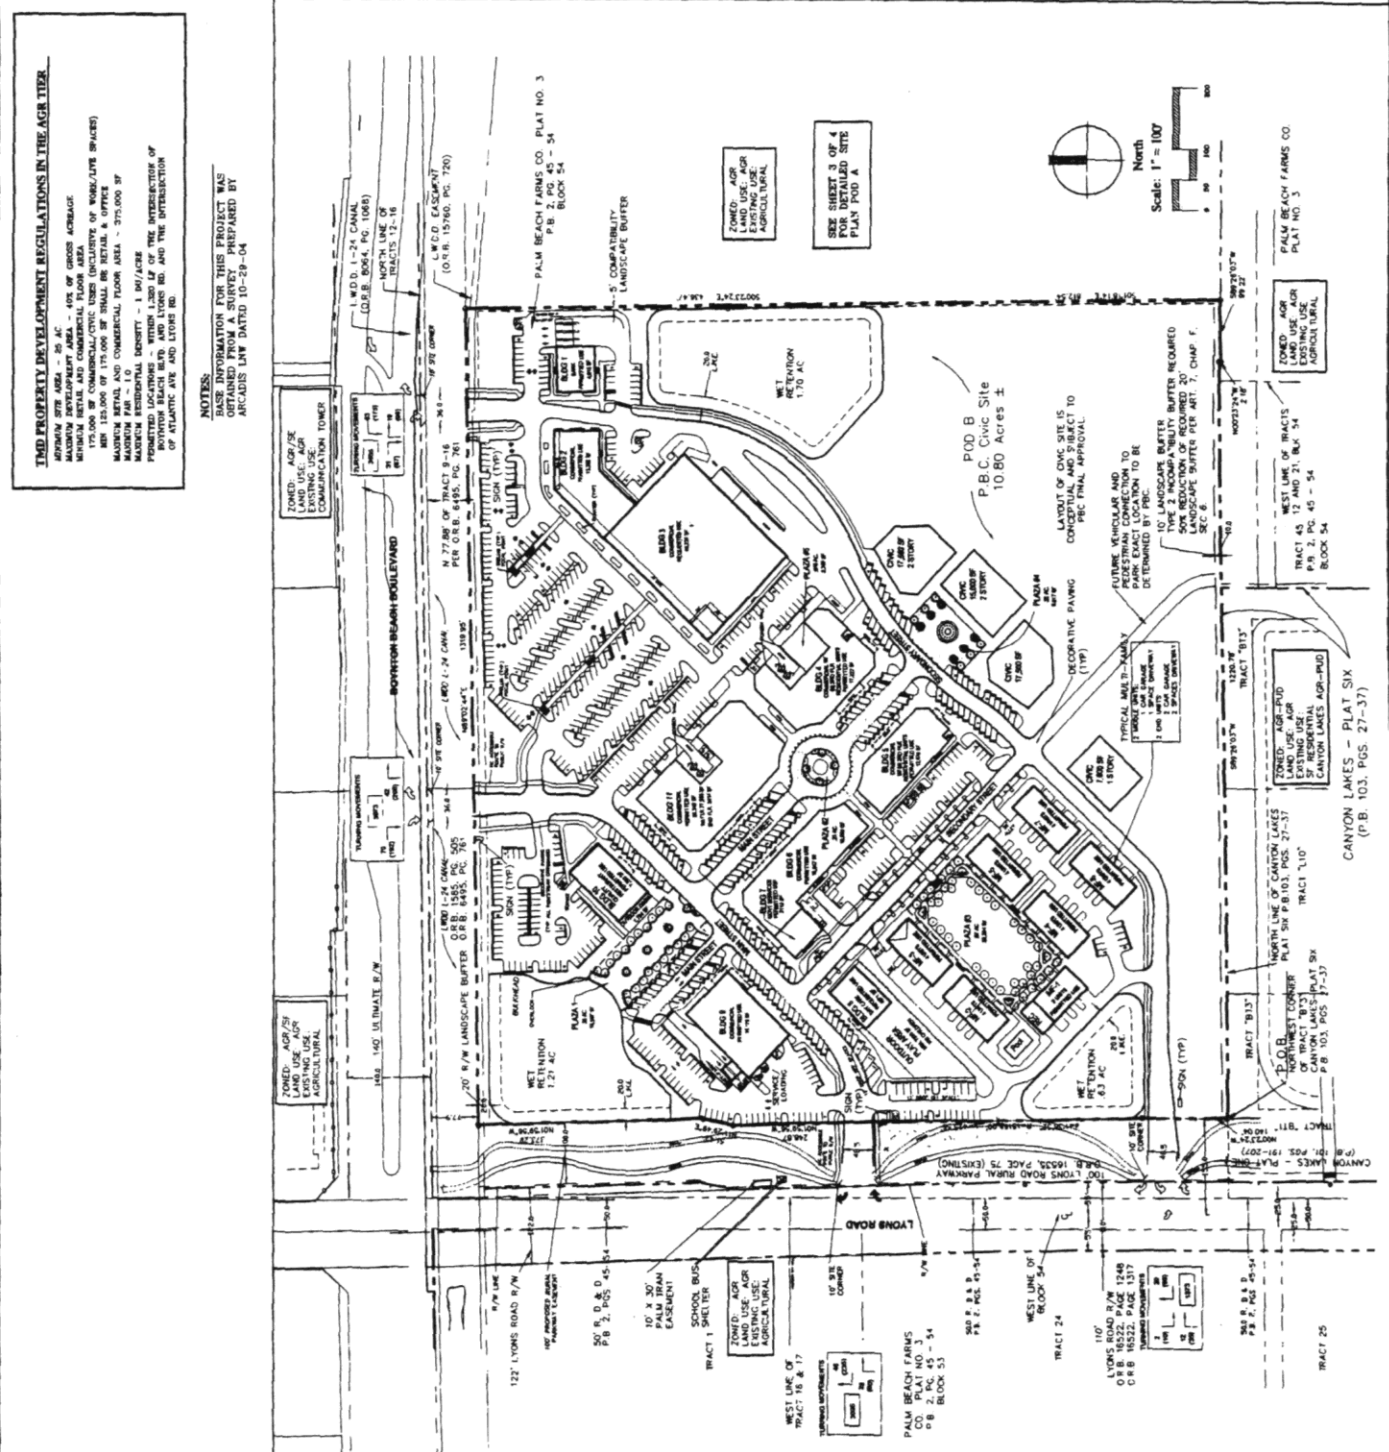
"Beauty Contest" Site Plan approved August 25, 2005
